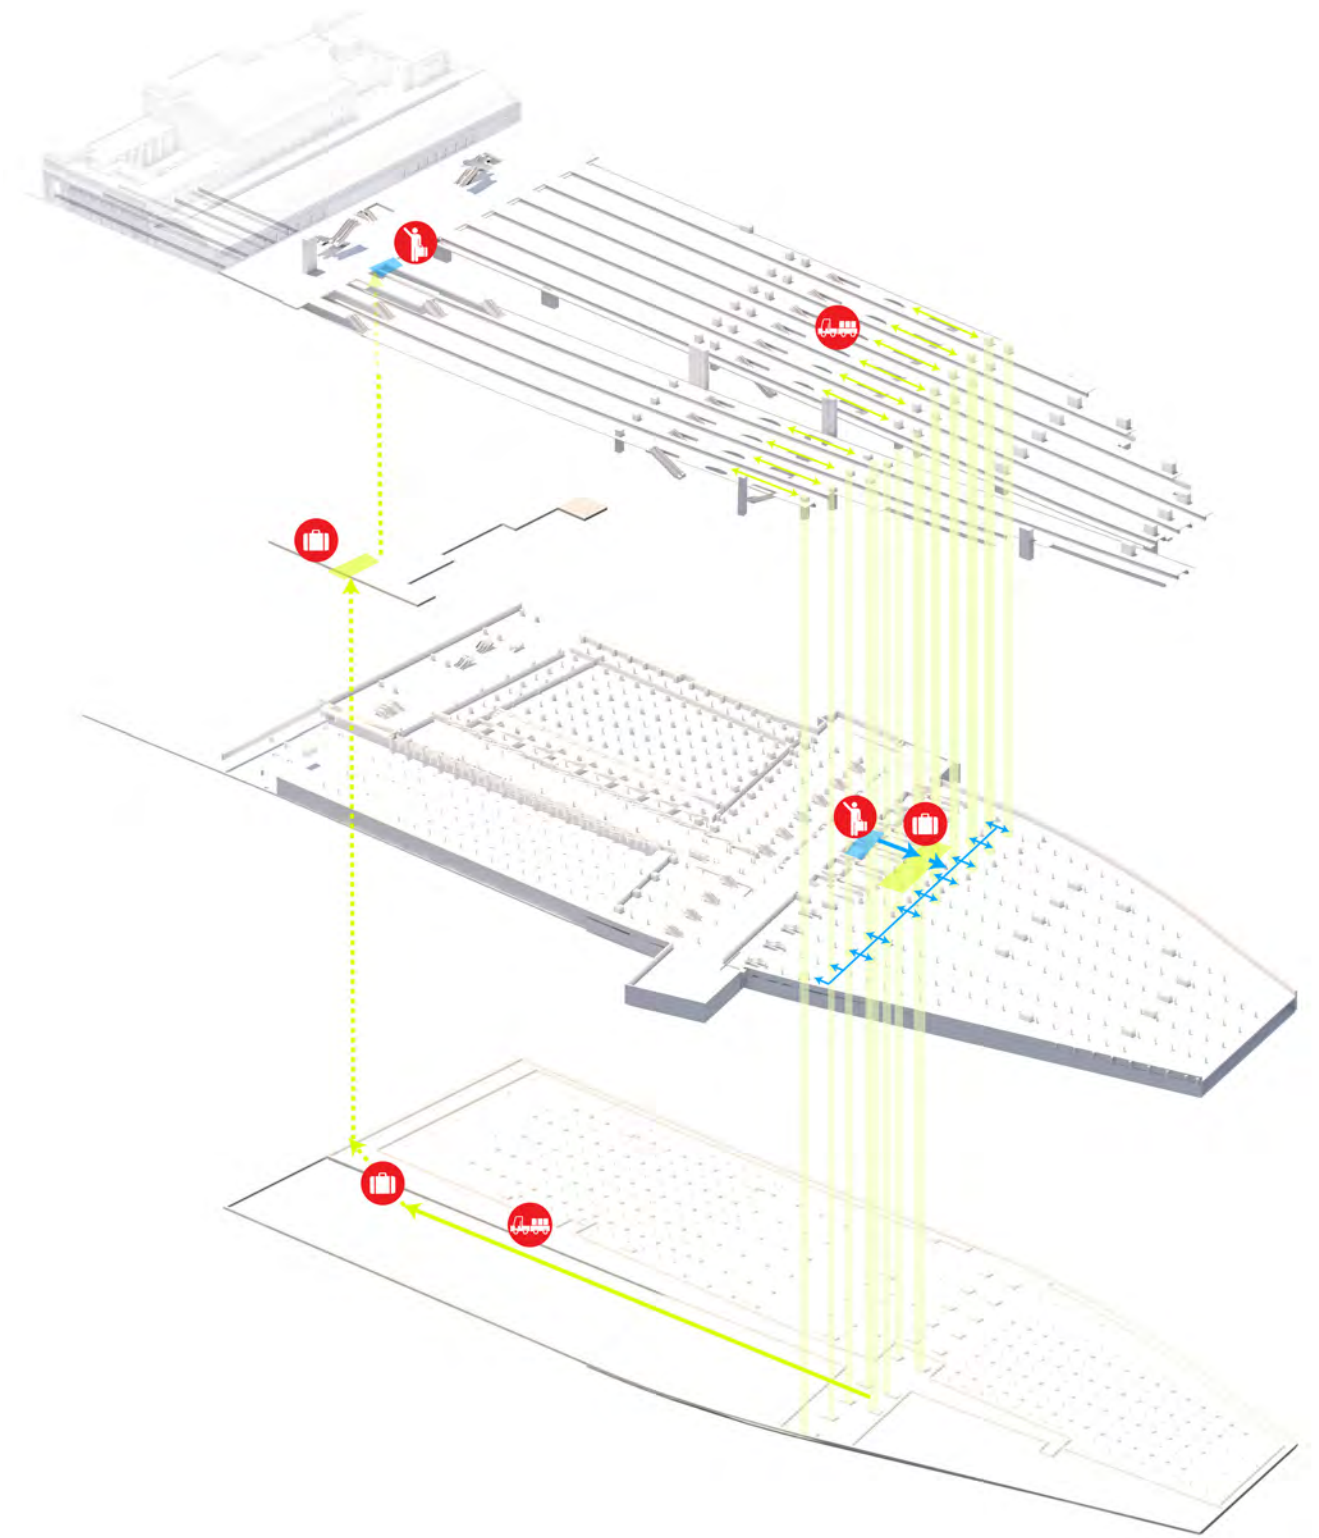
SCREENING AND LOADING AT CORNER OF K AND 2ND STREETS
